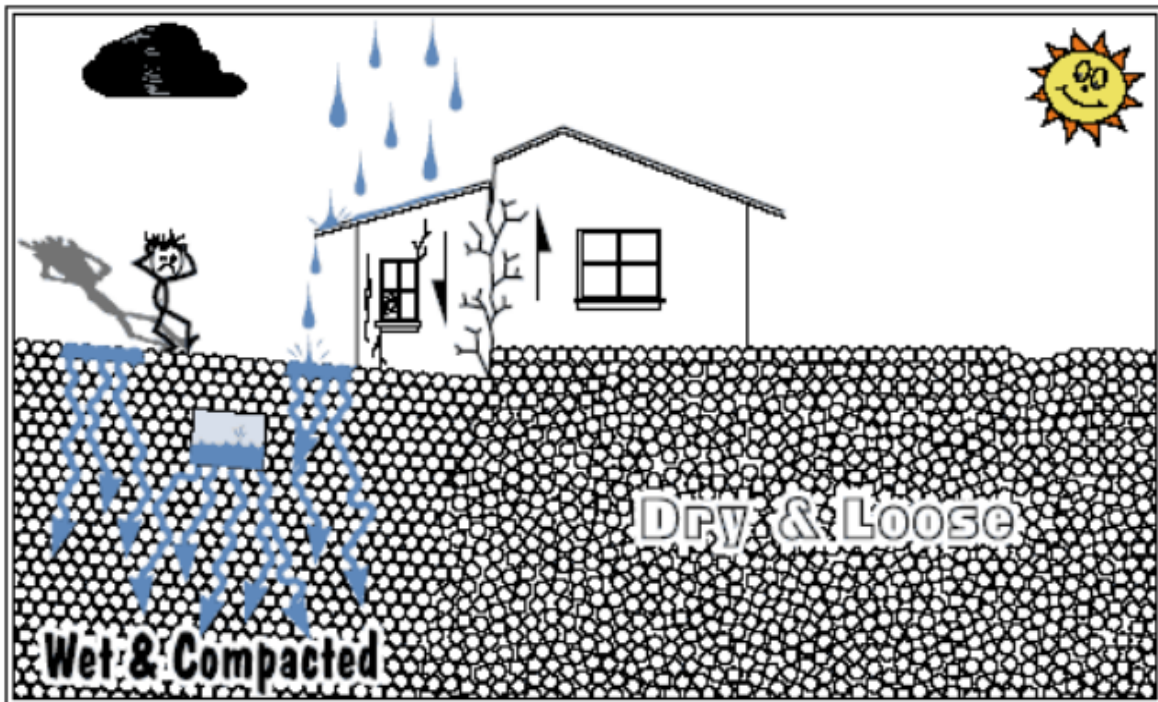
1: House constructed on collapsible soil without early investigation (Houston et al., 2001)
